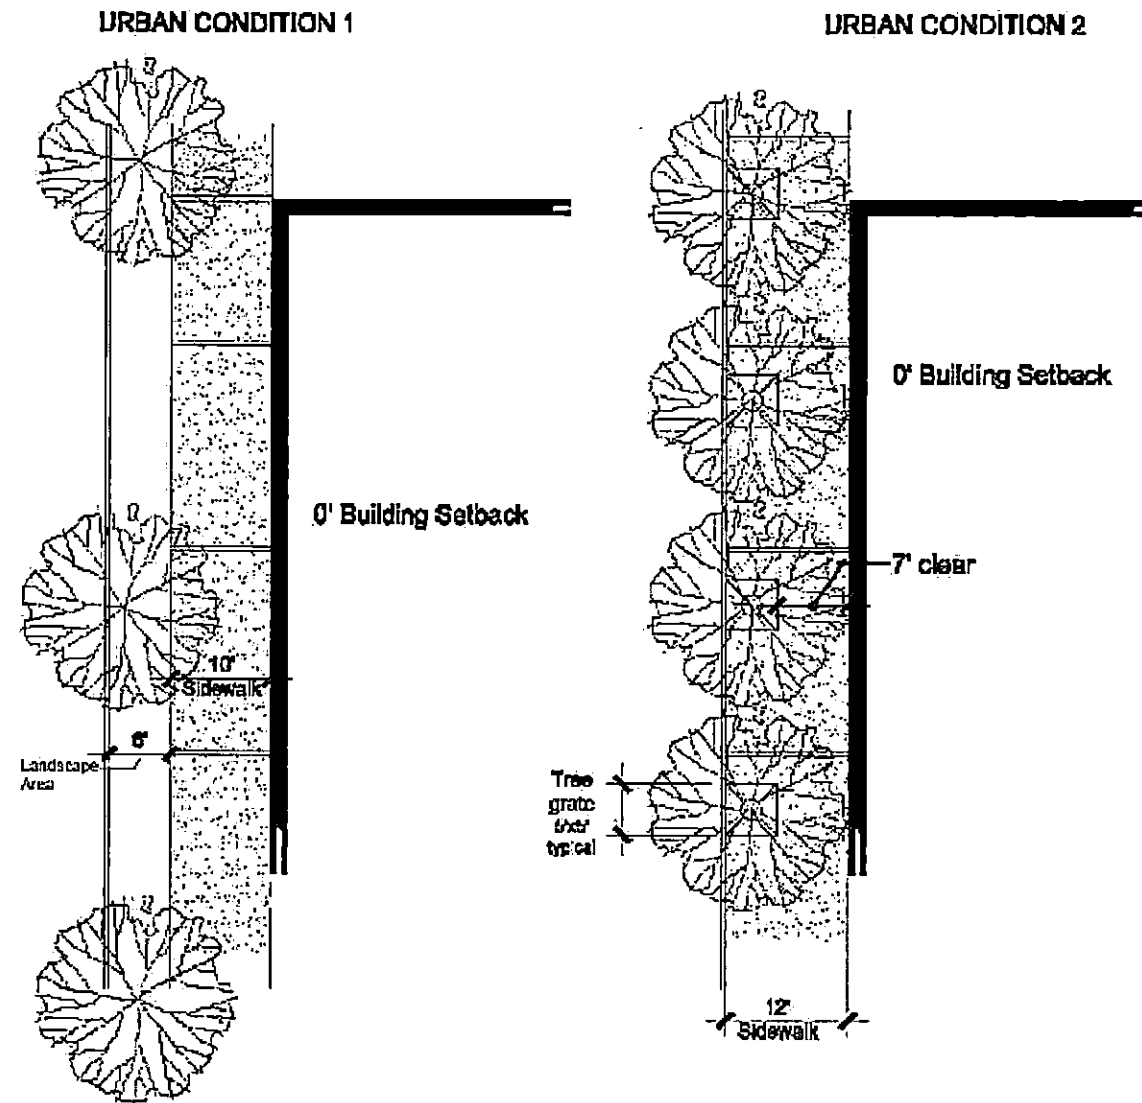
SPECIAL SETBACKS FOR MULTI-FAMILY BUILDINGS IN TOWN CENTER MIXED USE DISTRICTS Tree separation and buildings are conceptual and do not necessarily accurately depict actual development. All dimensions and notes are requirements.
